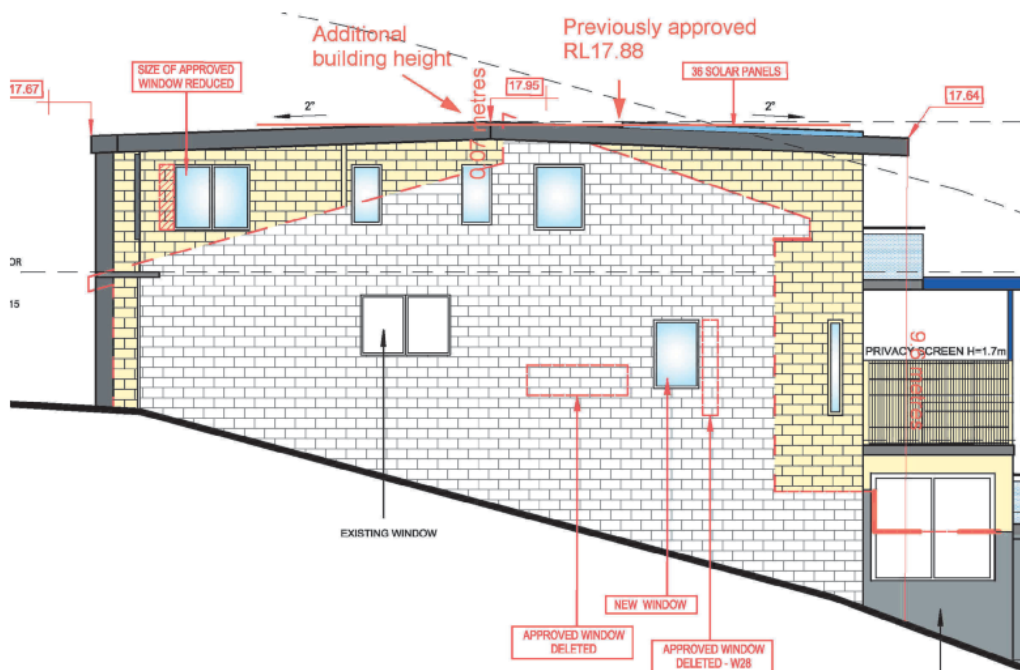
Additional Building Height (9.6m) and previously approved RL17.88 with modified RL17.95
